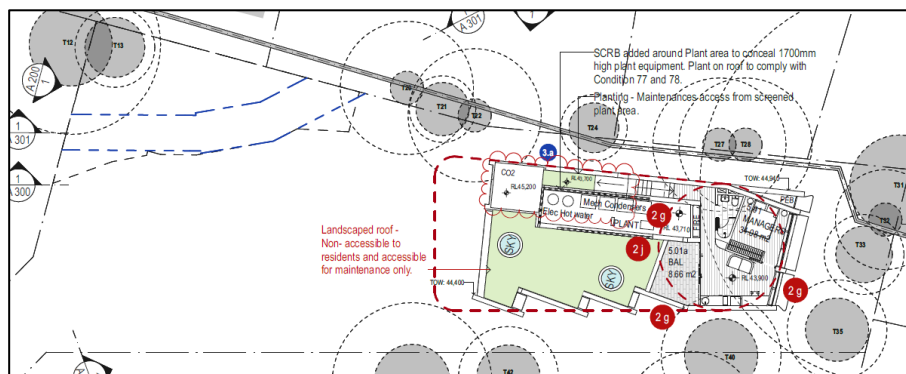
Proposed fifth floor plan (Source: TonkinZulaikhaGreer)
